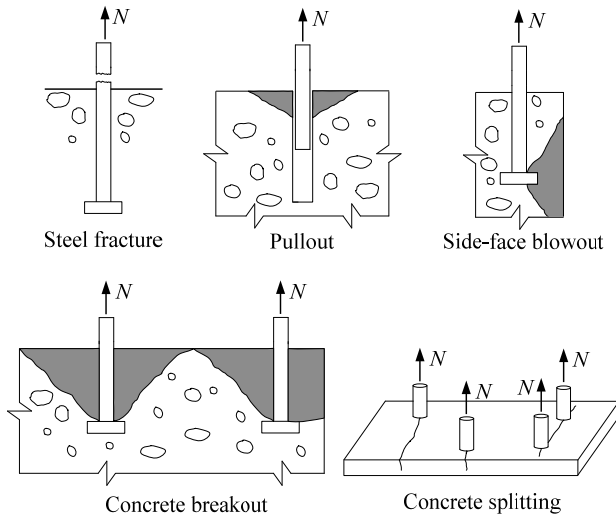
Failure modes for headed anchors (Reproduced; ACI 318-08, 2008)
